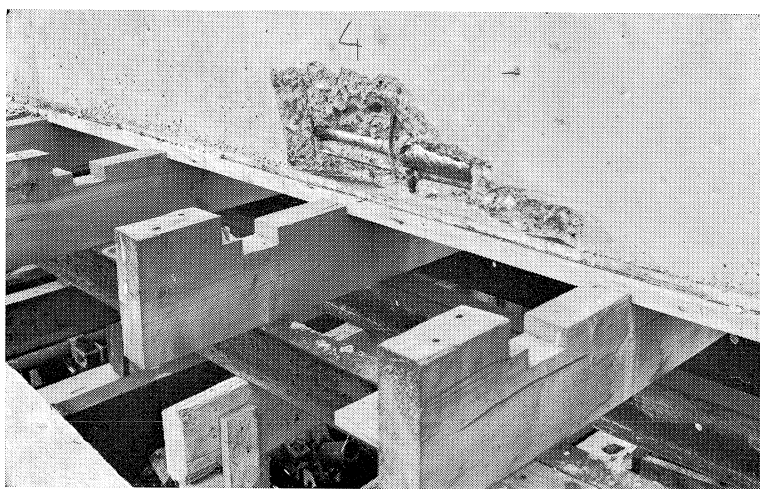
Concrete has spalled off in consequence of a splicing sleeve bearing against the concrete internally within the cable duct.
